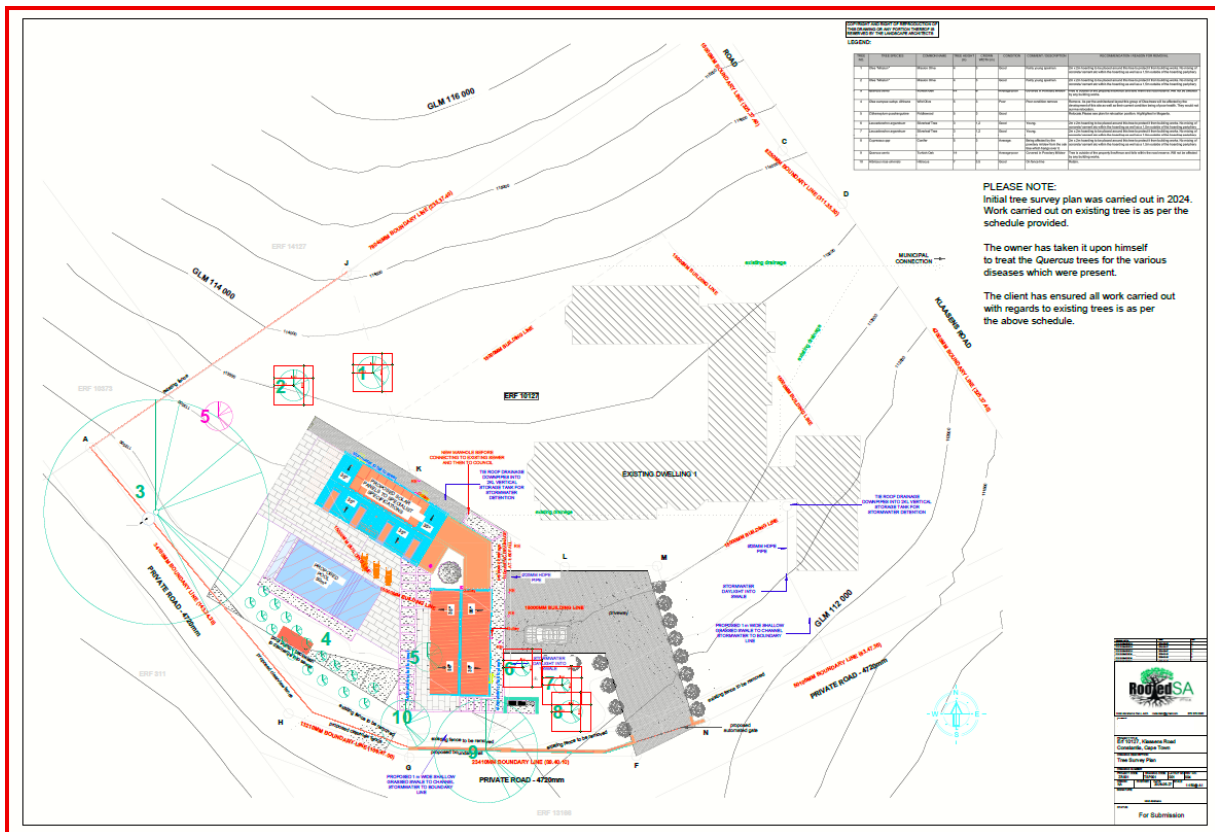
Tree Plan for the approval of the Second Dwelling REV04 (27/05/2026)
